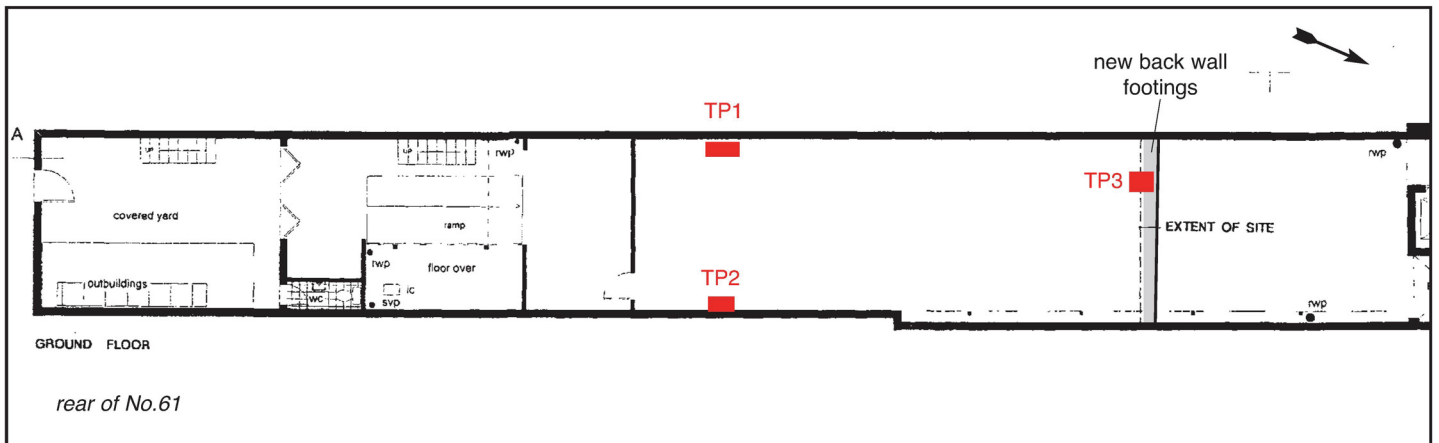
Plan showing study area in detail, scale 1:500 (top)
